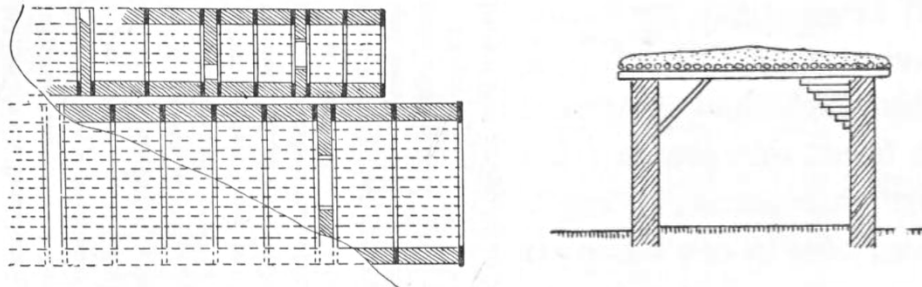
Troia, Megarons IIA and IIB in Level II, evidence and reconstruction for the corbelled horizontal or diagonal beams supporting the spanning roof beams and timber ribbing for ceiling cladding; plans of Megarons IIA and IIB (a; left) and reconstructed section for IIA (b; right) [22].
